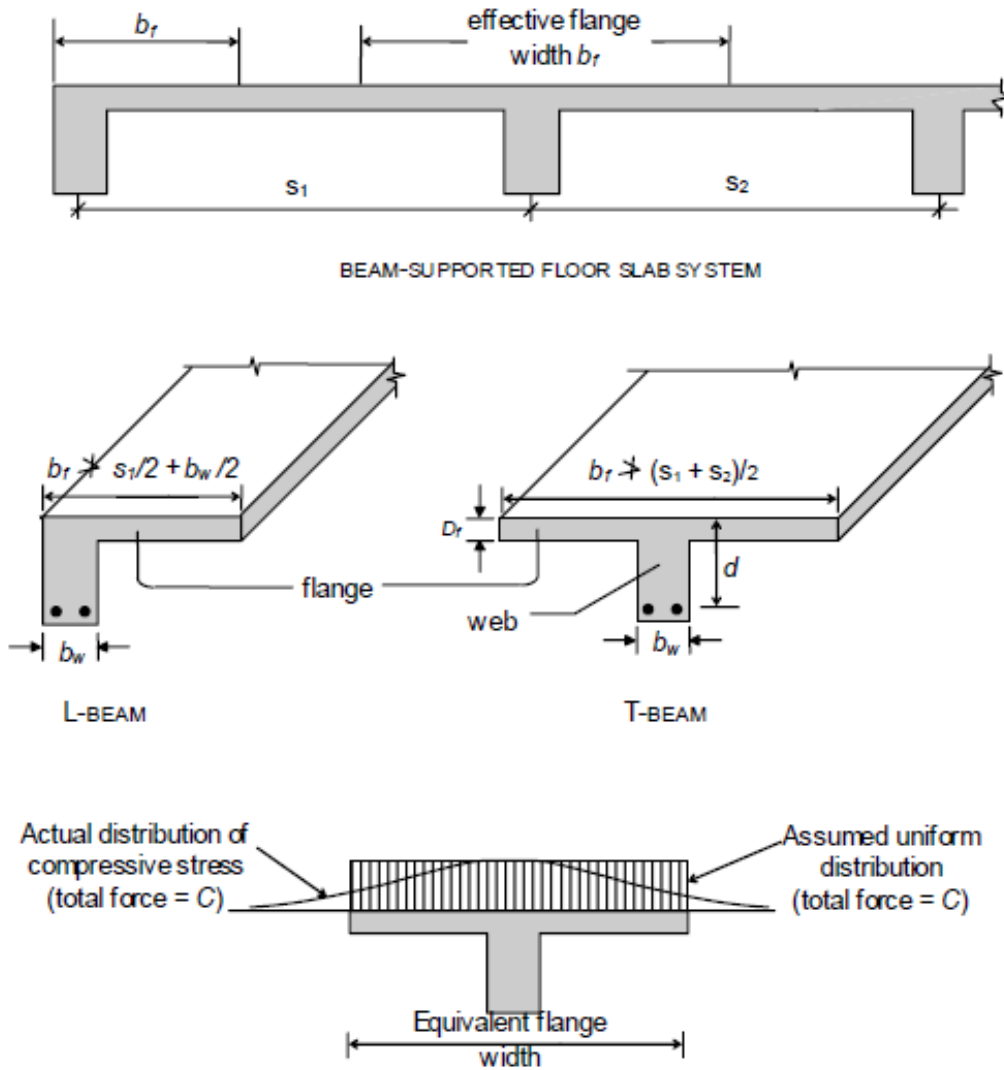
3 T-beams and L-beams in beam-supported floor slab systems
